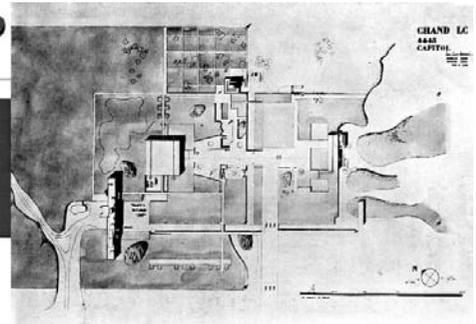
The Government Centre Plan. Definitive Layout. On the outskirts of the city near the greatest station and furnished with railway siding is the industrial zone, a future industrial zone also has been planned on the far side of the proposed second station. That is to say on the extreme south of the town. The most refreshing part of the town, where both mind and body are uplifted, runs parallel with the main approach road on its north east side. This park land which contains in its upper part the ministerial house, the university and museums of the town, in the south business more emphatically a leisure space and incorporates beautiful existing groves of trees. It will be traversed through-out its length by a pleasure motor drive and also a specific pedestrian walk. This latter way is the existing erosion valley exploited with the water cascaded and made into ghylls from where the pedestrian will be invited to take part in various spontaneous delights and leisure pleasures of an extensive kind, such as the small open air theatre, a little lido for bathing and swimming and so on; its lower level beneath the main city creating an atmosphere of intimacy. Here in a country where the sky is thick with stars at night and the moonlight a tangible web of gold, where fireflies abound, and the stars in the favorite instruments, the delights of the evening walk after the hot days use of a
